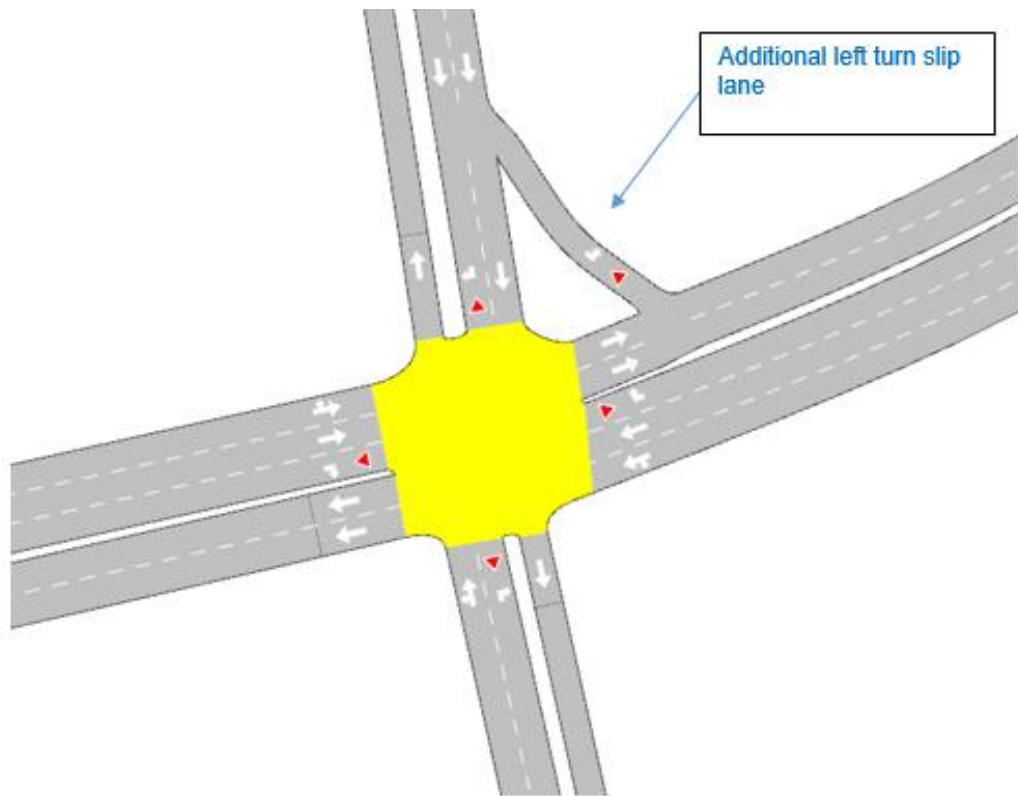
Modelled intersection layout at Townson Road and Victory Road
